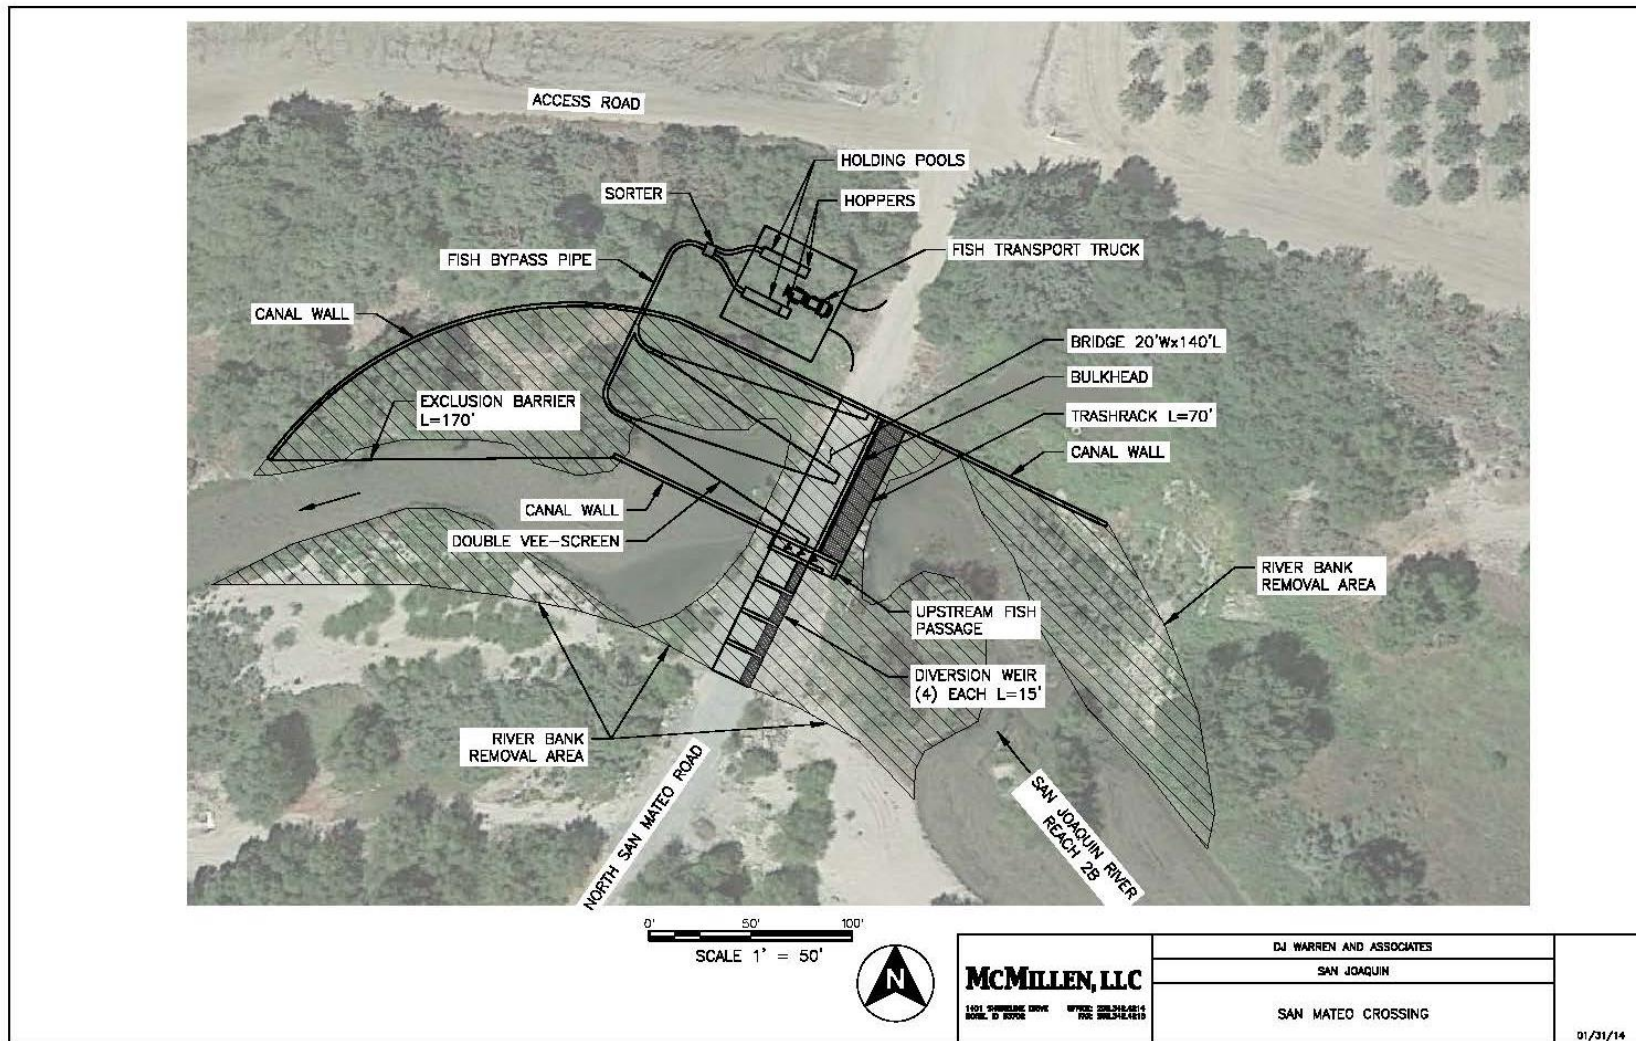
Alternative D: Conceptual design of San Mateo Crossing collection facility.
